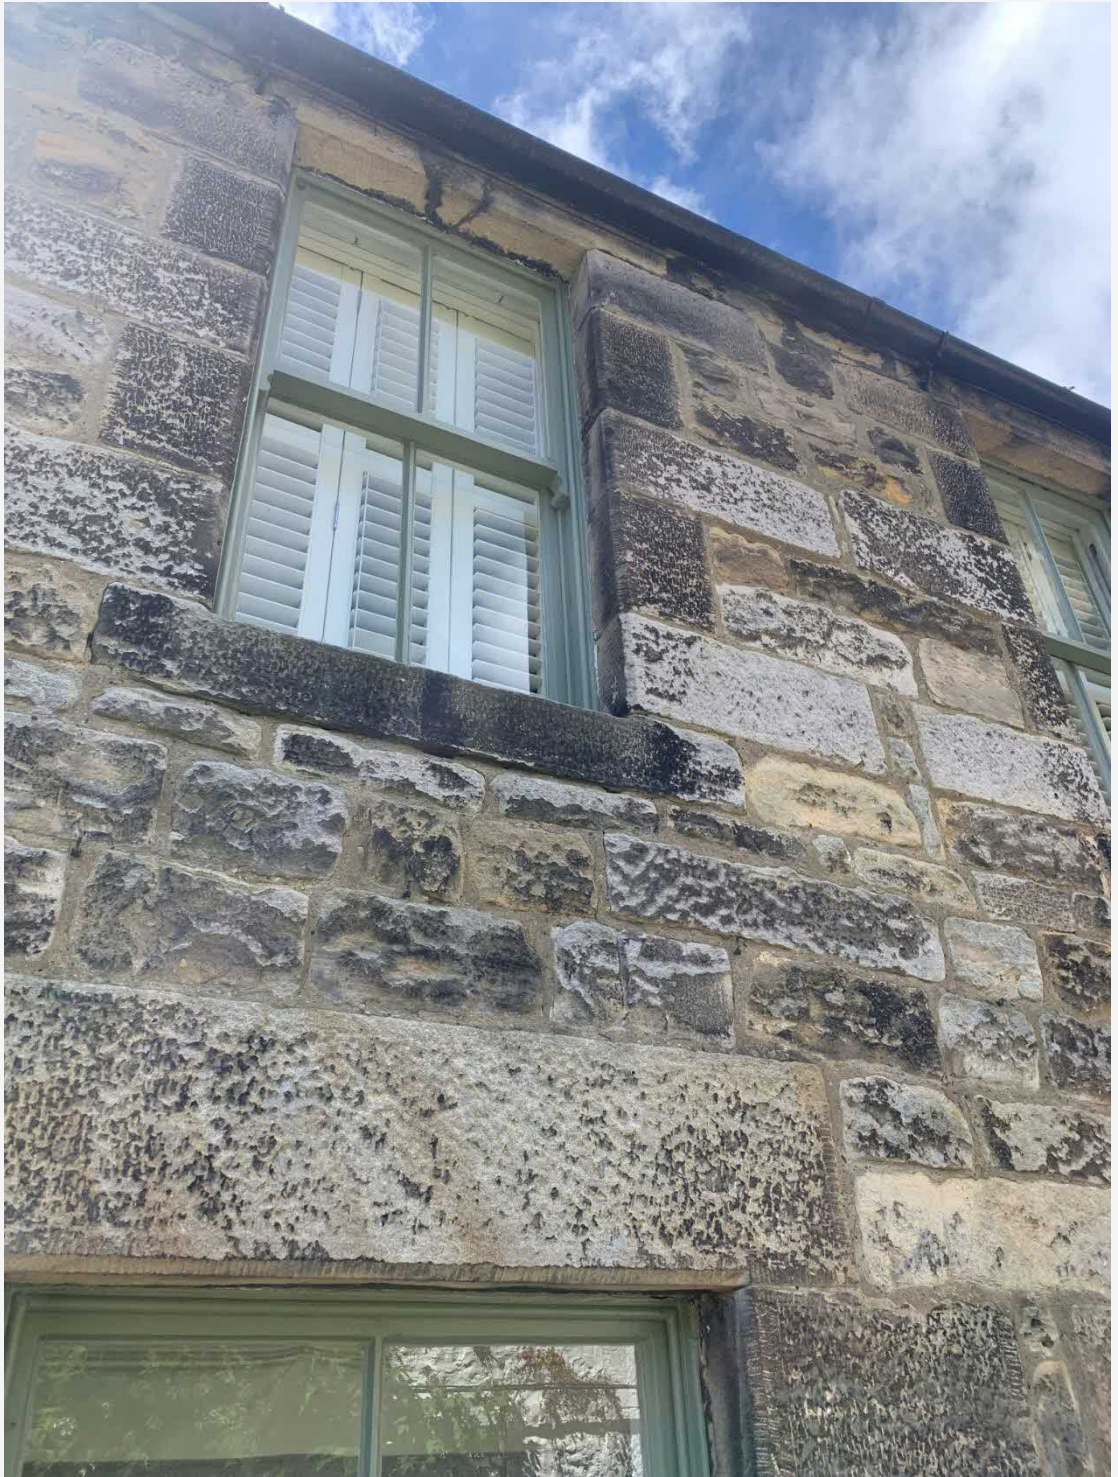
showing one of the existing kitchen windows (east elevation ground floor).
